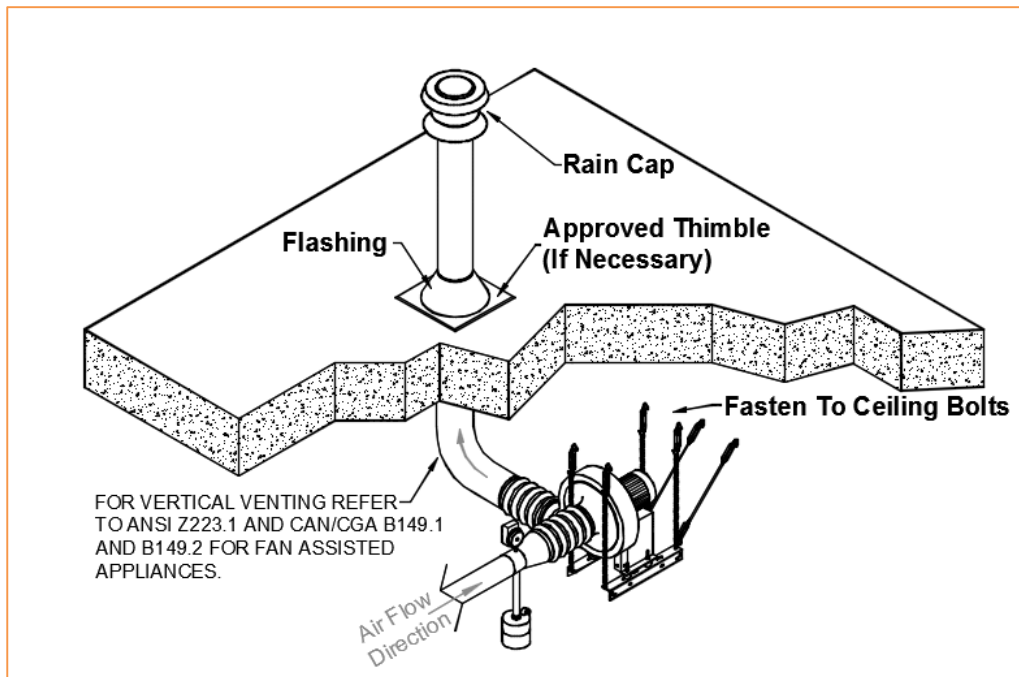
Ceiling Mounting - Recommended Venting (Vertical)
